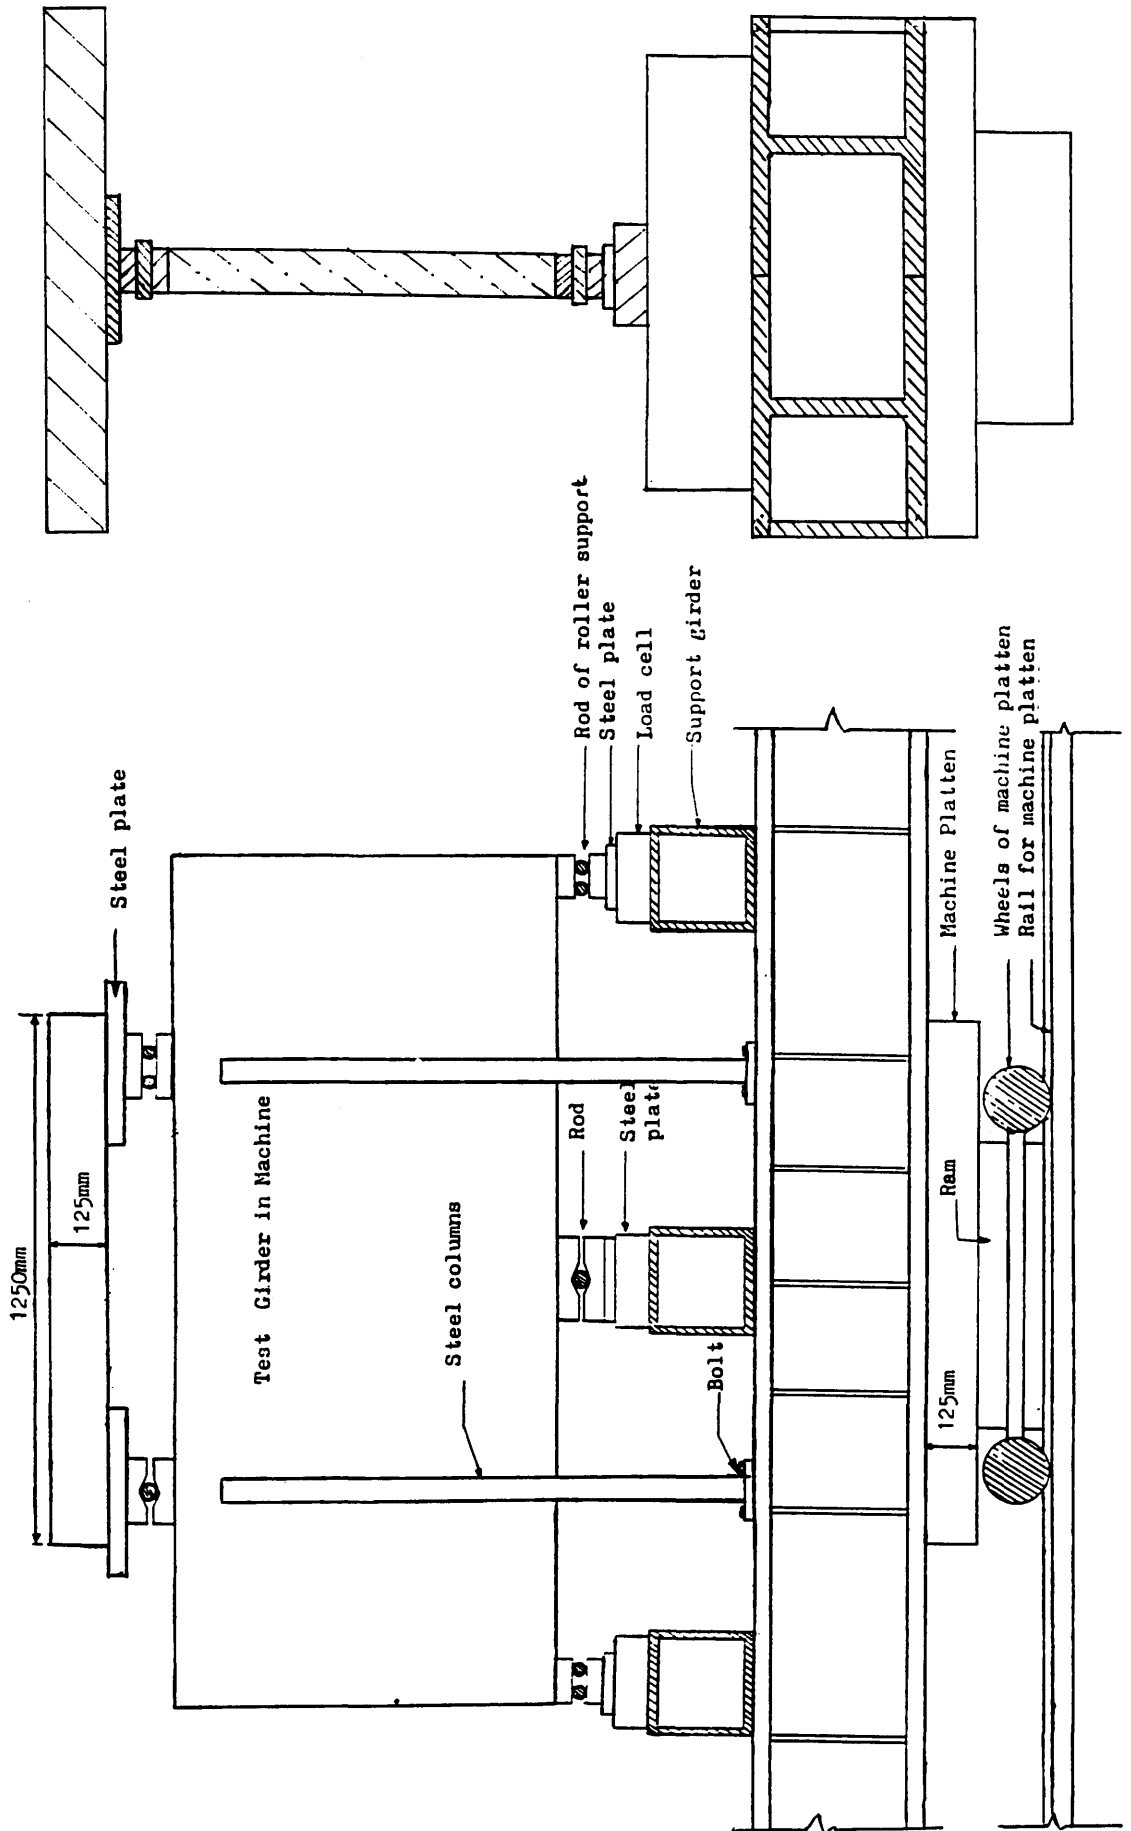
Test-rig for testing transfer girders ($L=2m$, and $D=0.9m$)
